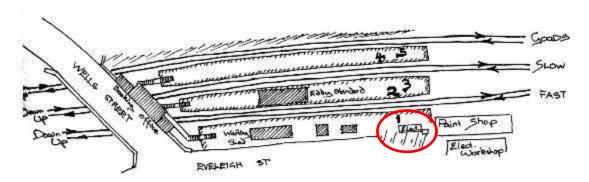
station layout showing the recently completed overhead booking office with its two wings, the platform one buildings from 1885, the Eddy station building on platform 2/3 and the new platform 4/5 which had become an island platform even though goods line only ran adjacent to platform 5. Also note the Electrical workshop. Drawing courtesy of Estate of Martin Davies from private report titled NSWGR – Devonshire St to Illawarra Junction Part 1 – University Historical Archaeology II Project 1978
